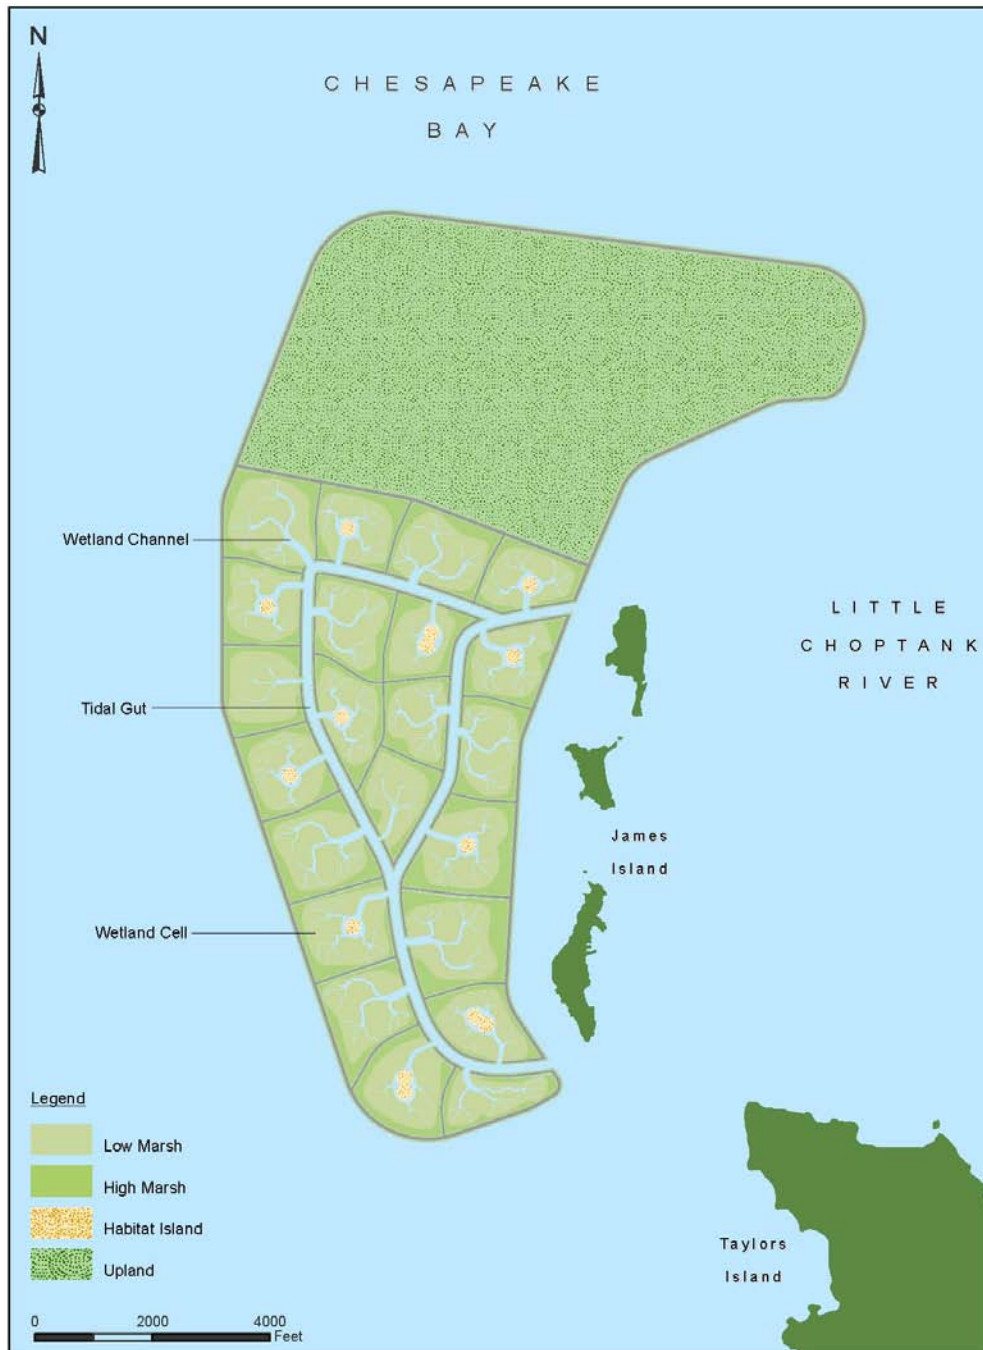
Wetlands Concept Plan for Recommended Plan at James Island
